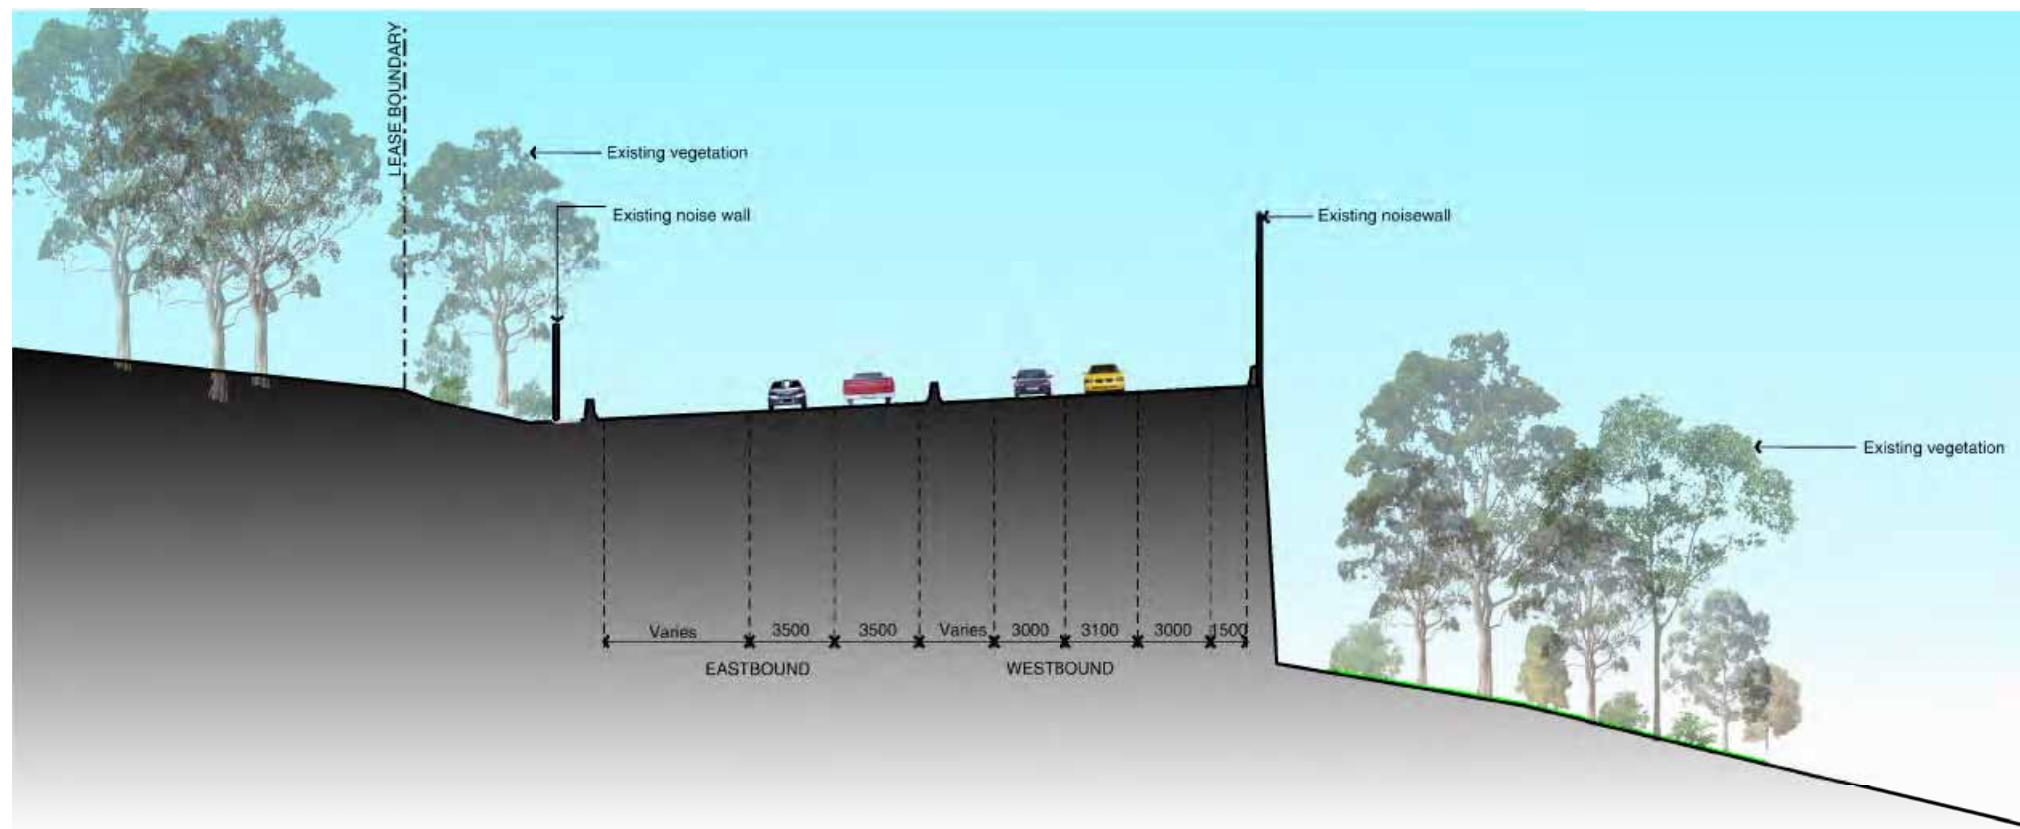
Stn 13600 Somerset Street east - Existing
